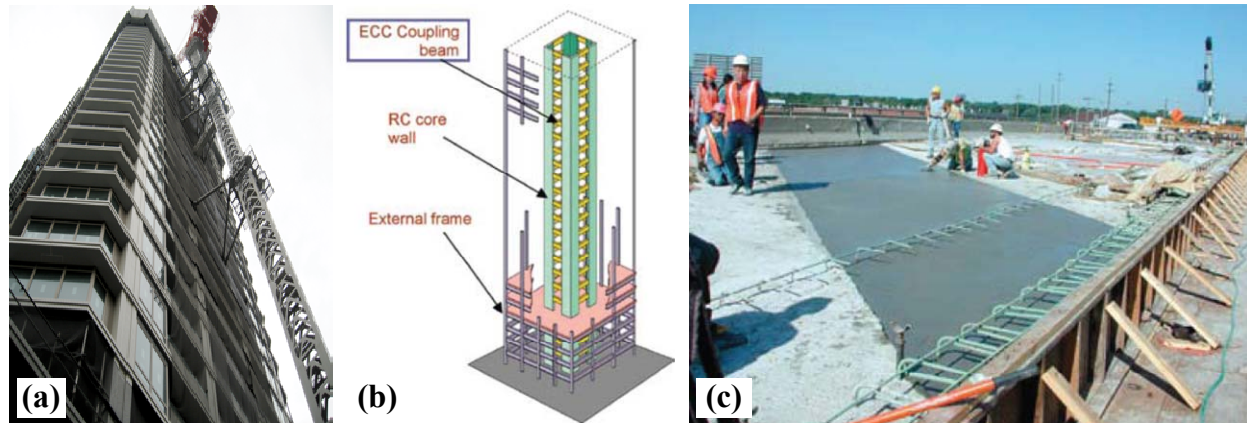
Structural applications of ECC, (a) Nabeaure Tower, Yokohama, Japan, (b) Glorio Roppongi High Rise, Tokyo, Japan, (c) Groove Street Bridge, Ypsilanti, Michigan, USA
